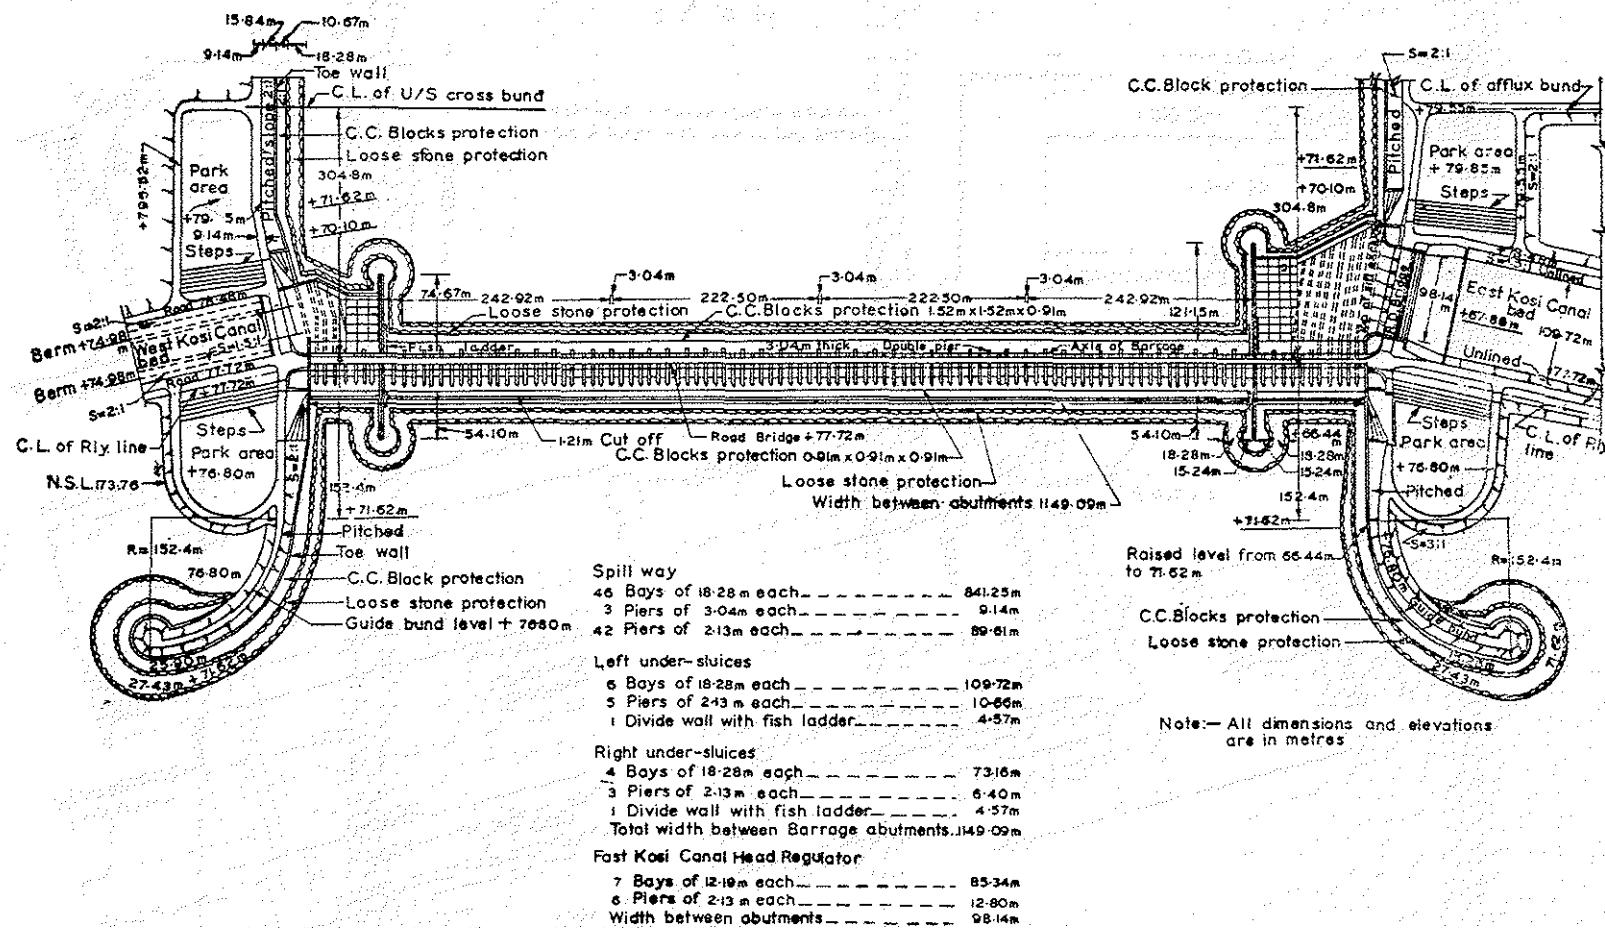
Kosi Barrage detailed Layout Plan.
